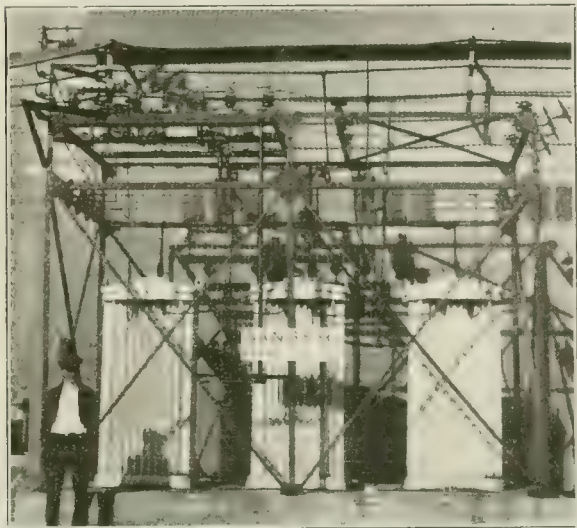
STANDARD 13,200-VOLT OUTDOOR SUBSTATION
